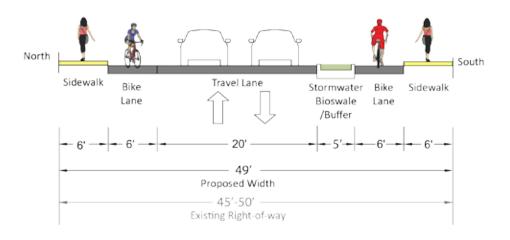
Proposed cross-section for Thompson Road, between 74th Avenue and Fuller Road
